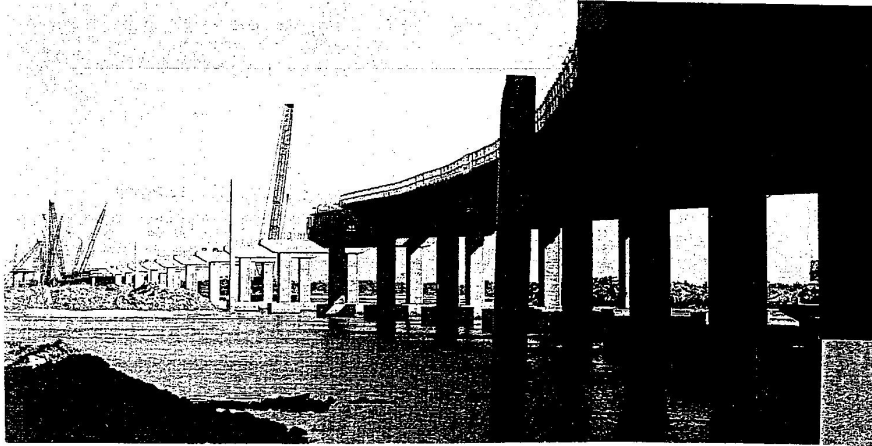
Looking west toward Biloxi from the east shore, many superstructure spans of US-90 Biloxi-Ocean Springs bridge were displaced north off their piers (photo credit: J. O'Connor, MCEER) (NIST, 2006).
